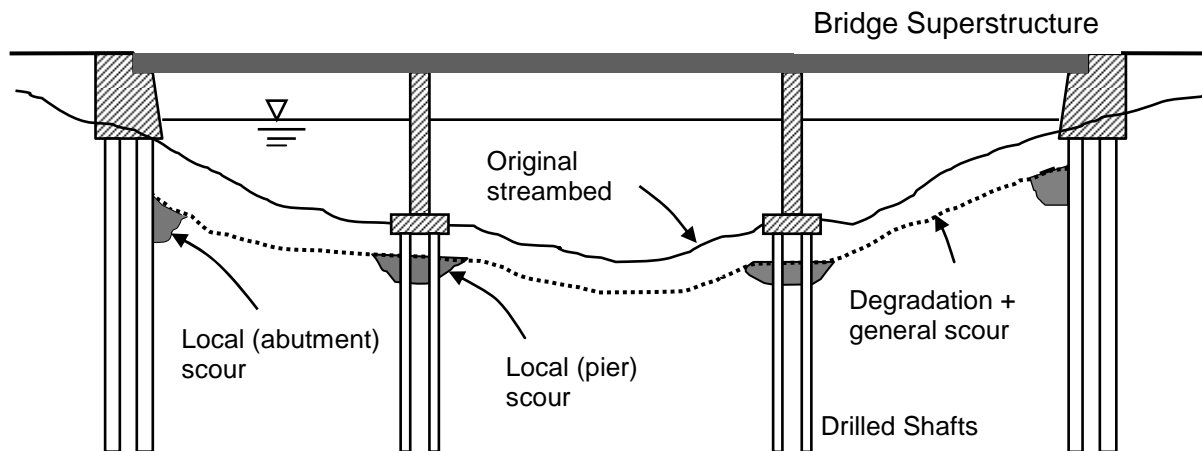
Components of Scour Affecting Bridge Supports on Deep Foundations
